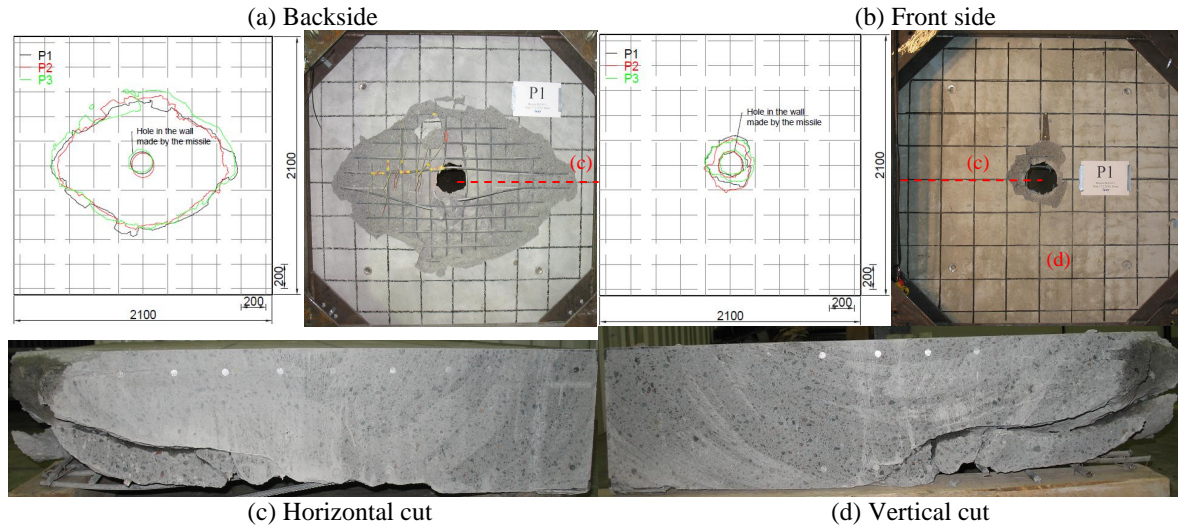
Schematic drawings of the damage of the wall with scabbing and spalling areas and photographs showing the damage in the test P1.
